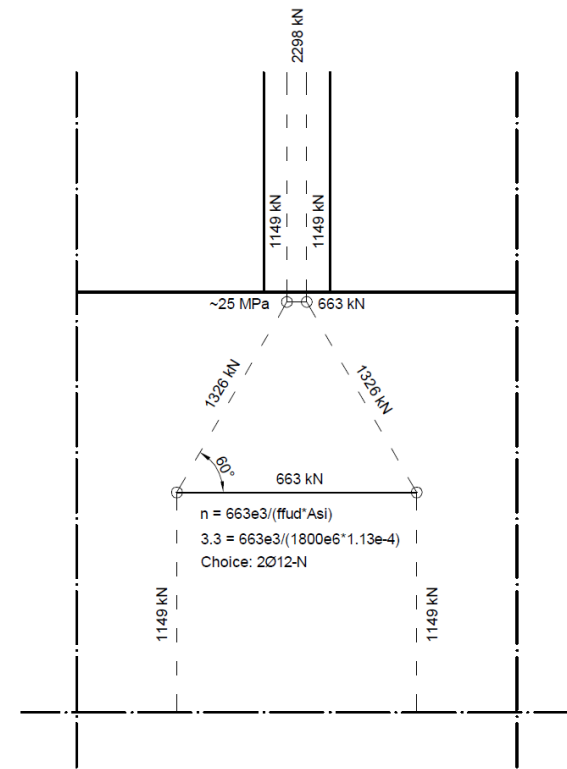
Strut and tie model for design of CFRP splitting reinforcement.
